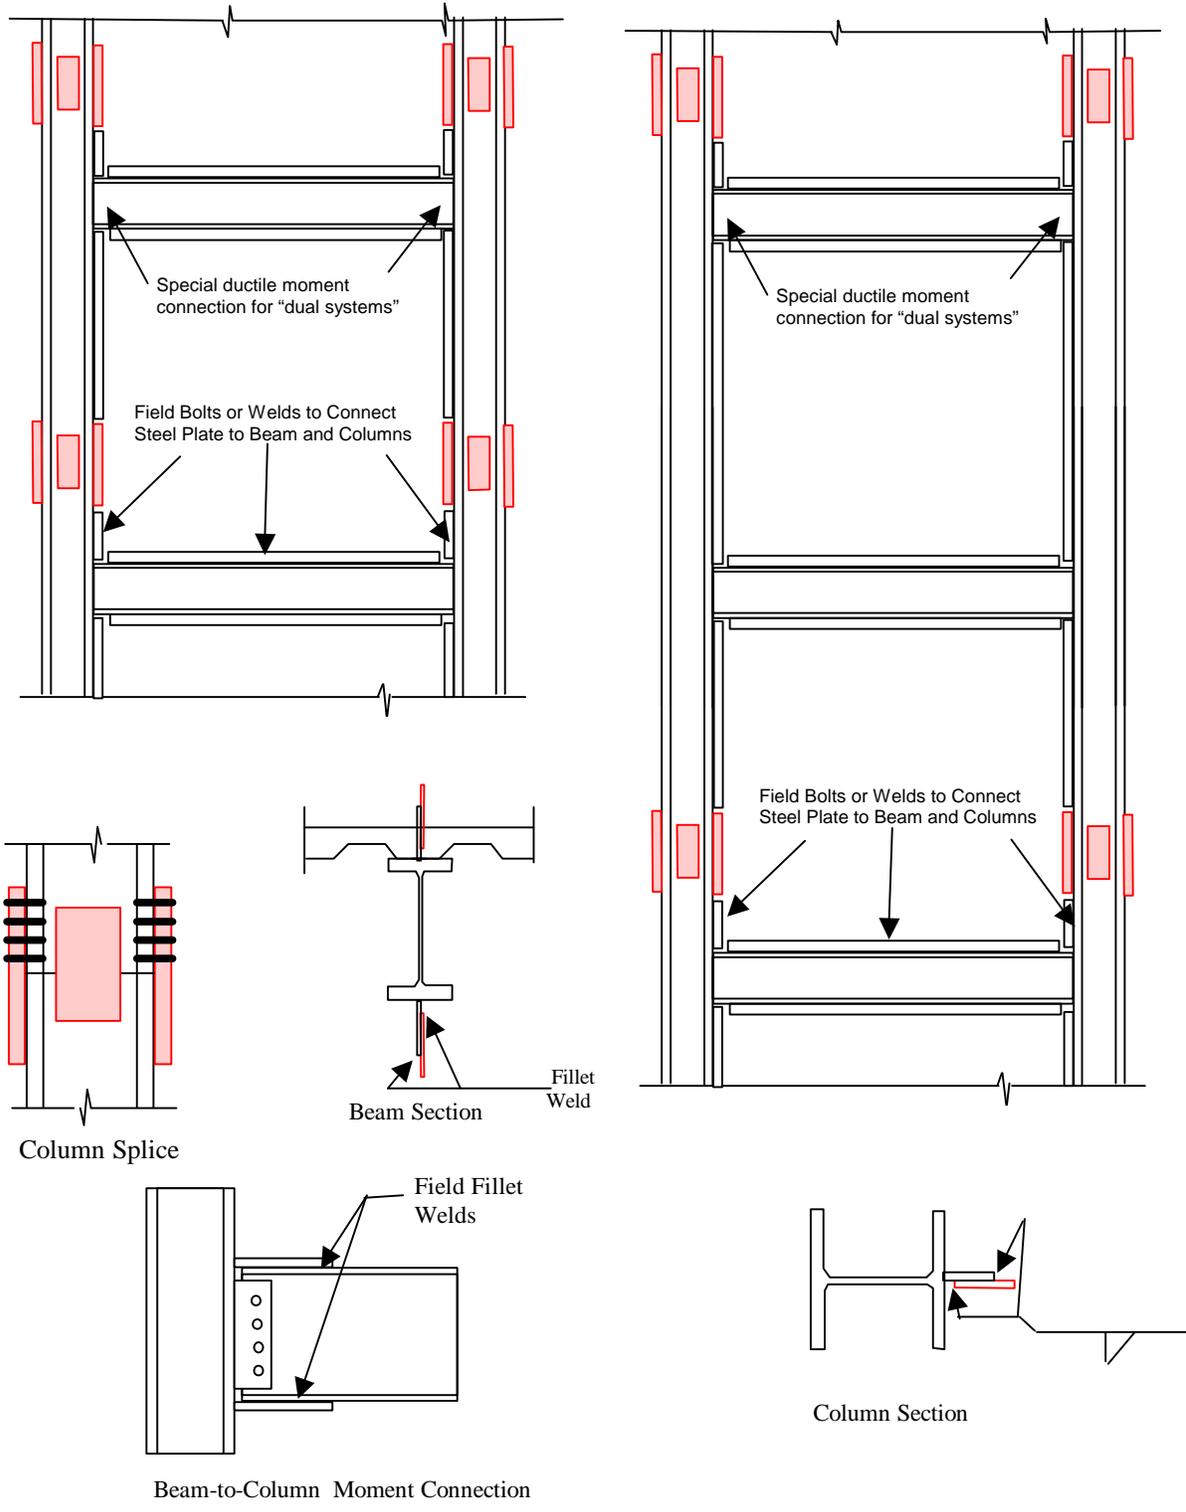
Shop-welded, field-bolted steel plate shear wall
